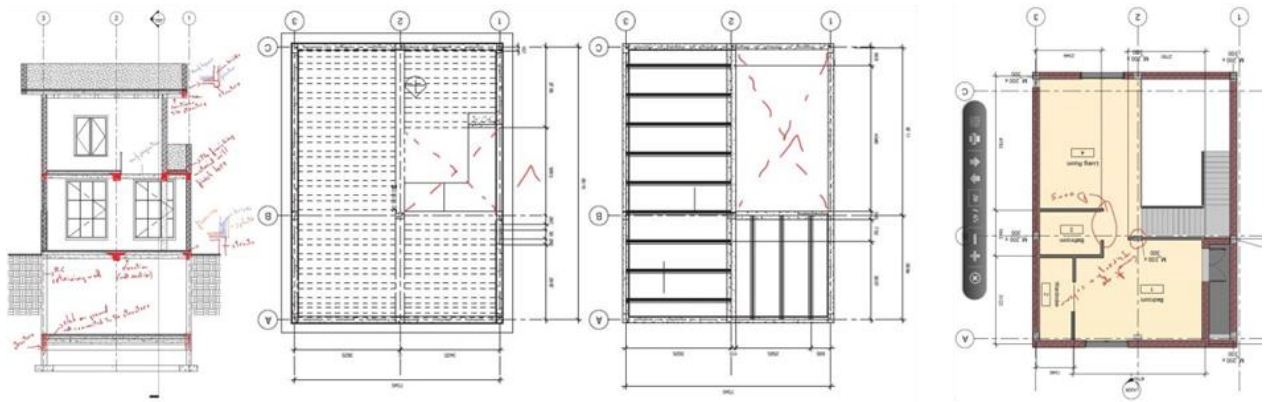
Section development, Structural plan alternatives, Final plan (Student BS Spring14)
